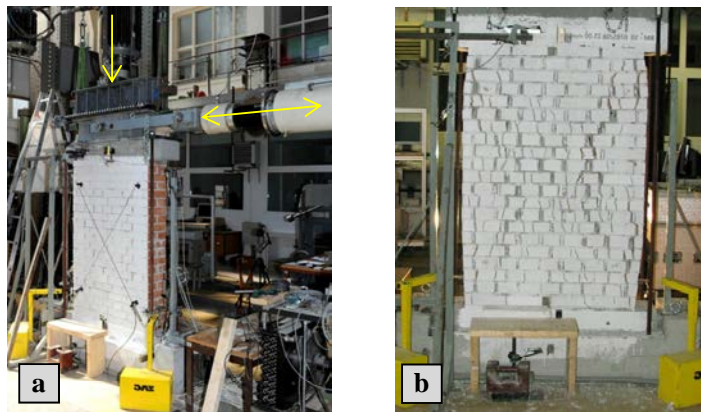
Test setup for laboratory cyclic shear test (a) and shear damage of reference wall (b).
